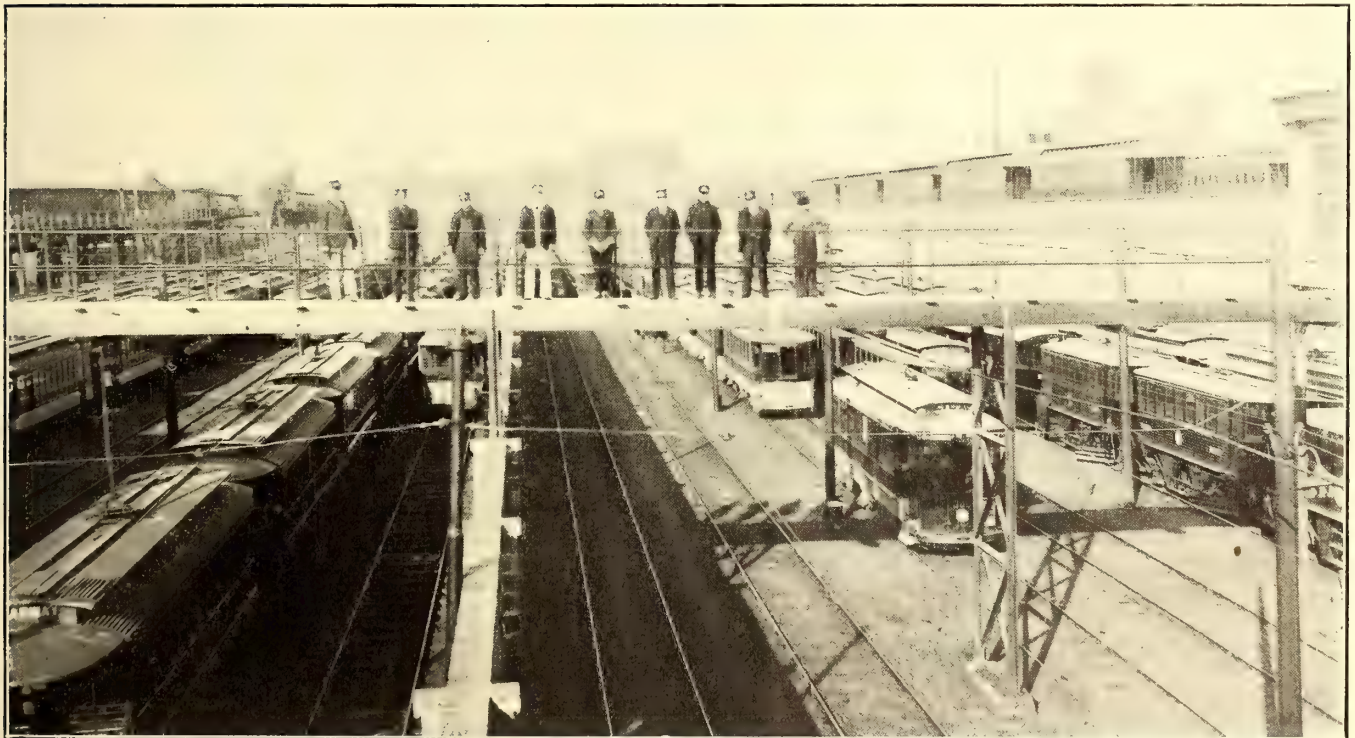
BRIDGE FROM THE ELEVATED TRAIN DISPATCHER'S BUILDING, CROSSING THE SURFACE-CAR STORAGE YARD TO THE ELEVATED CAR STORAGE YARD AND TRACKS TO INSPECTION BUILDING
